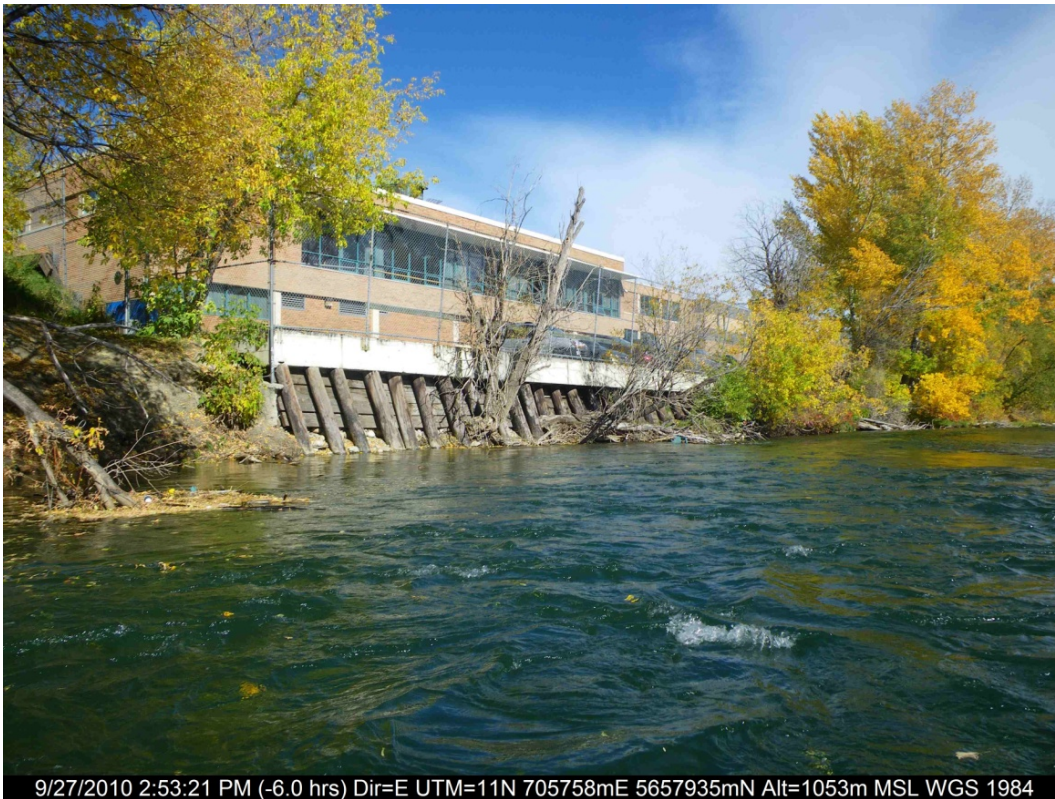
Retaining Wall Structure Along Elbow River, Mission (Credit: AMEC / Cows and Fish)
